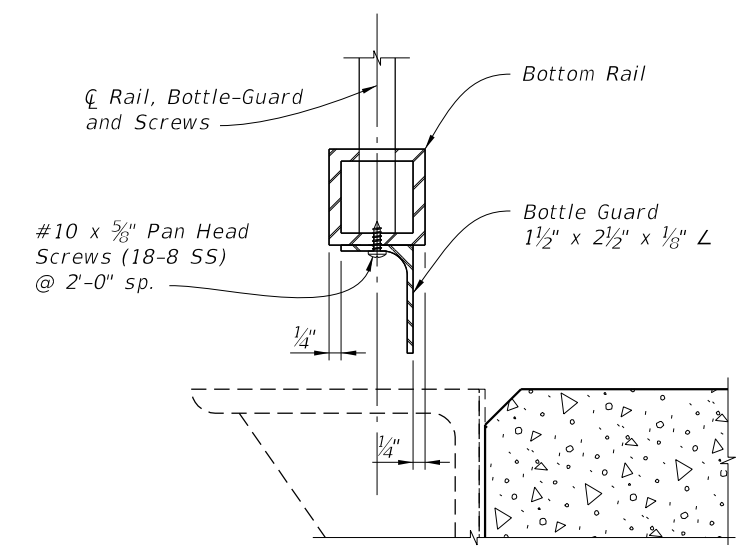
DETAIL "A" - SECTION AT INTERMEDIATE OPEN JOINT
